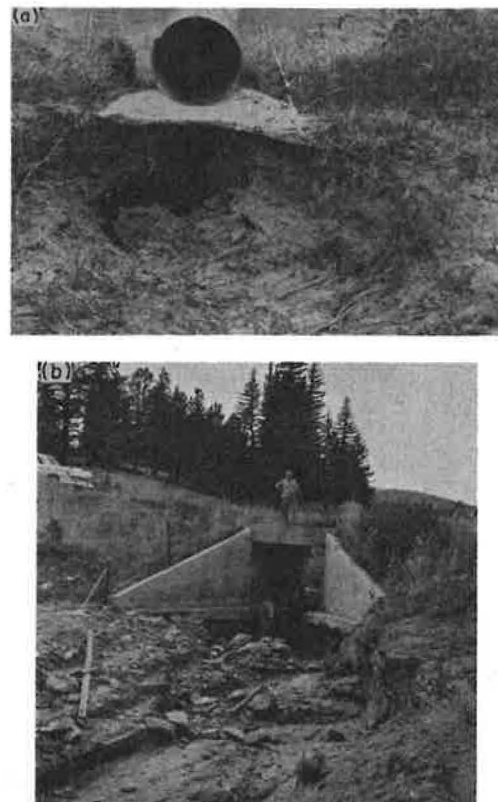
Erosion at culvert outlets caused by accelerated flow; (a) pipe culvert, and (b) box culvert.
